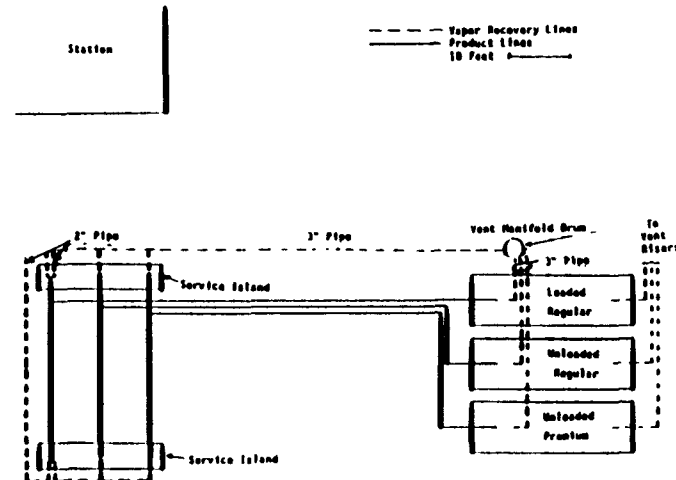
Stage II Underground Piping Layouts for Model Plant 2
